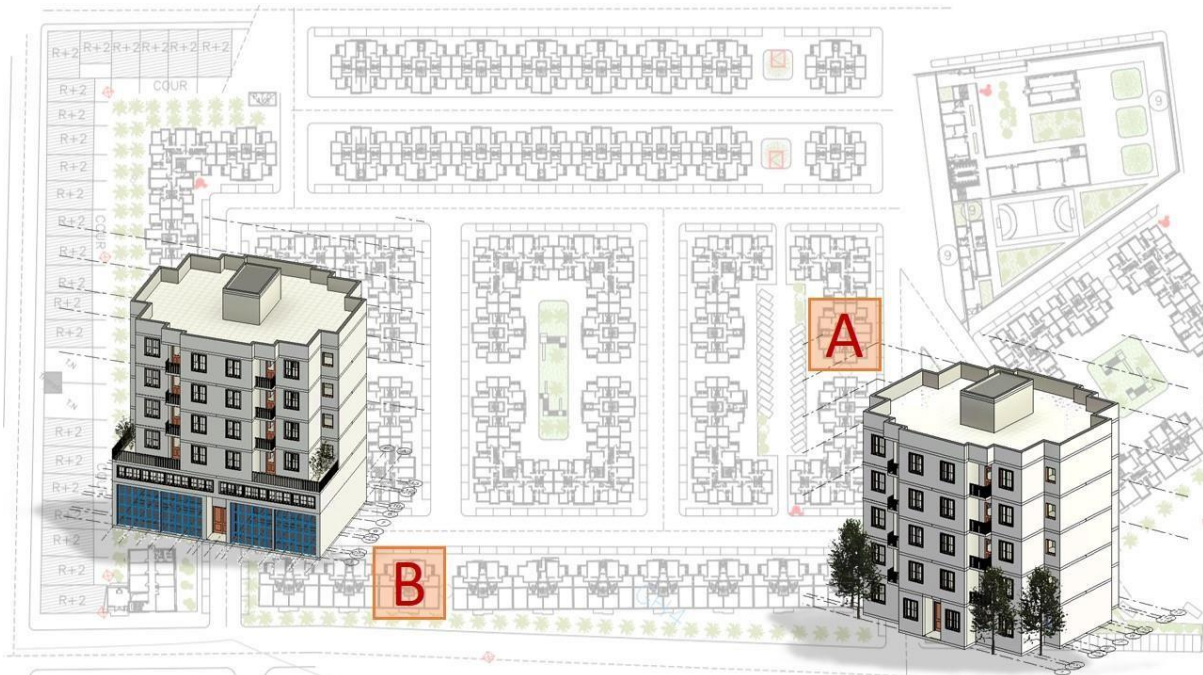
Master plan of the parceling and BIM models of the repetitive buildings type A and B
